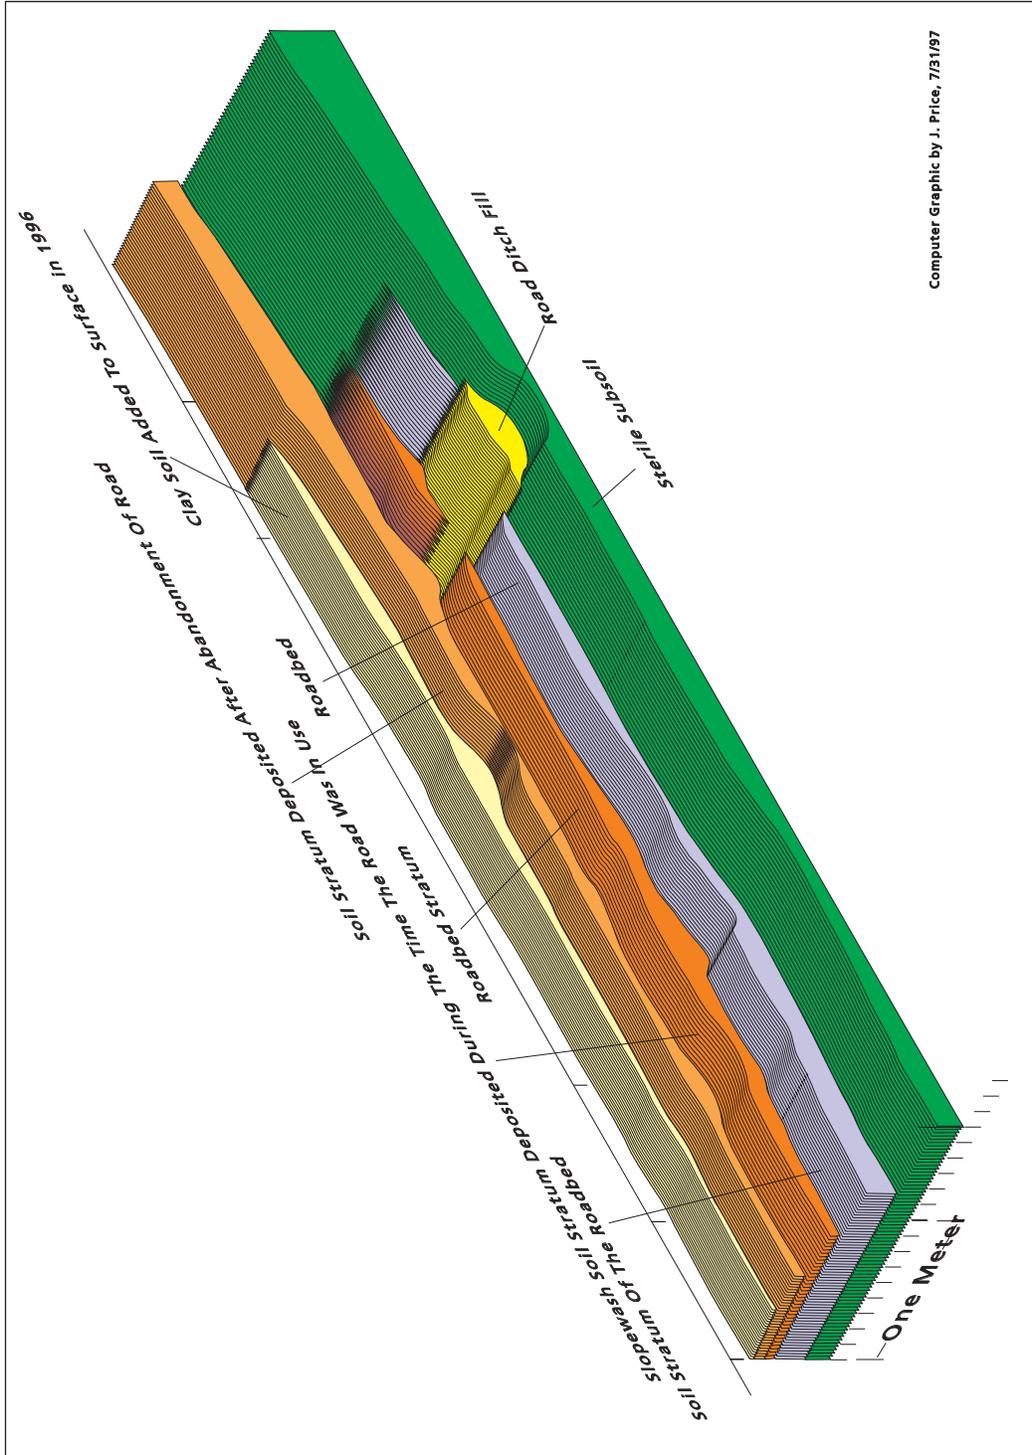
Model of road construction and natural deposition in Area 97-IV.
